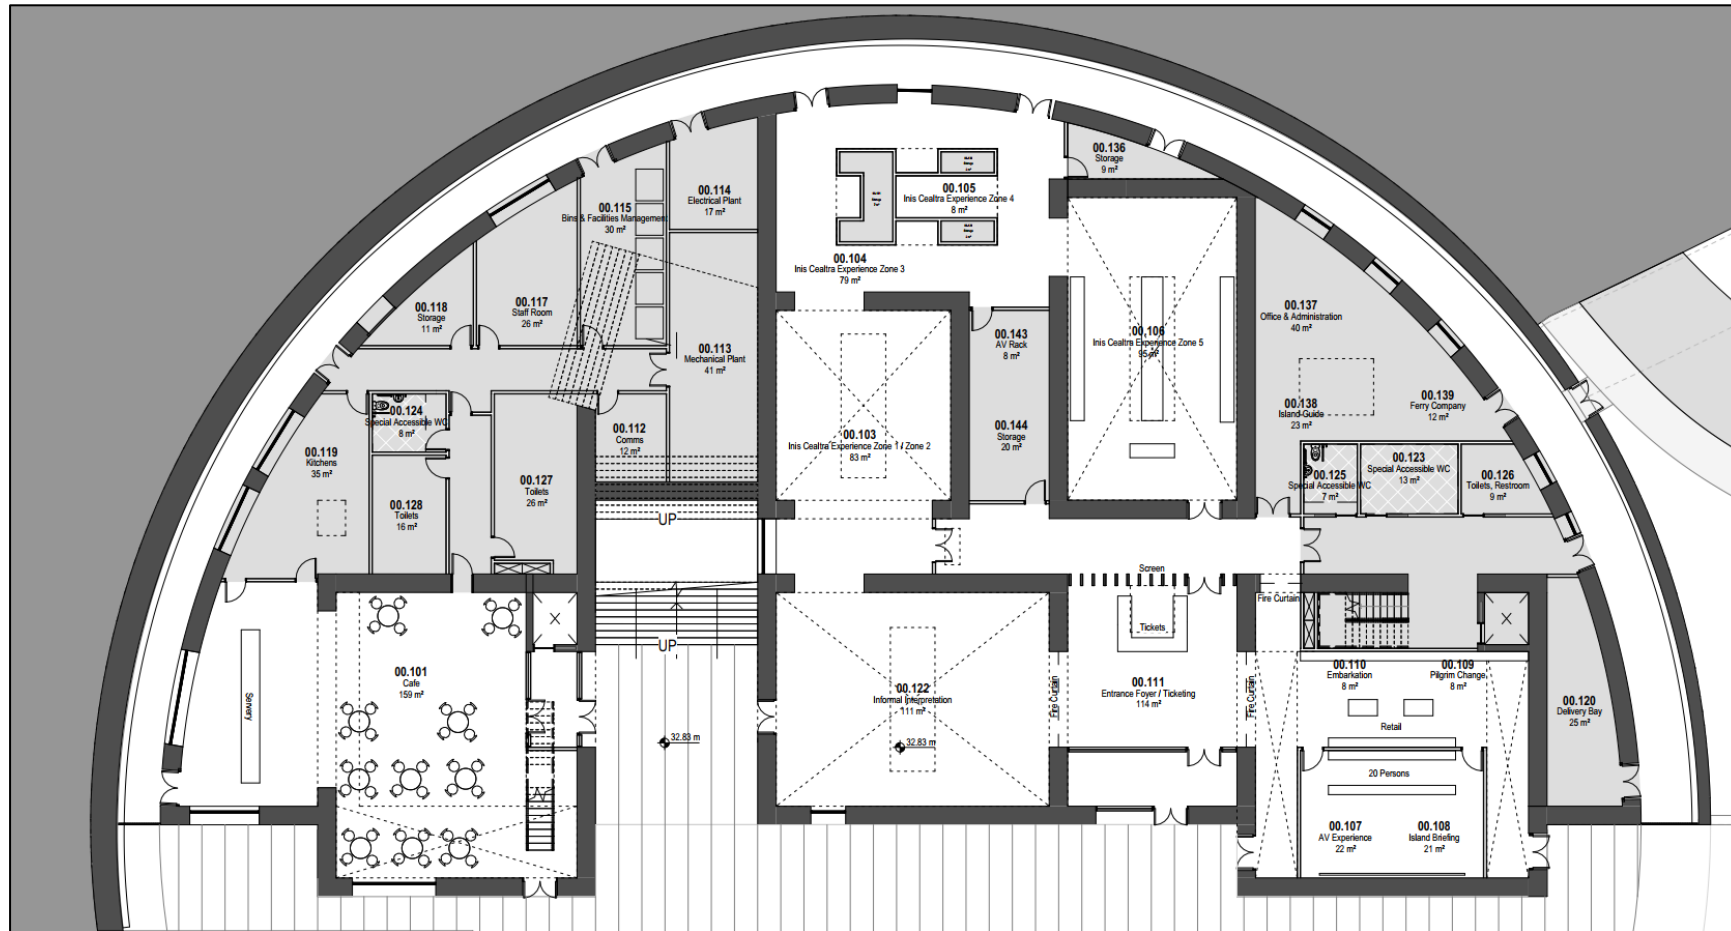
Ground floor plan extract of proposed Inis Cealtra Visitor Centre in Mountshannon Village.
